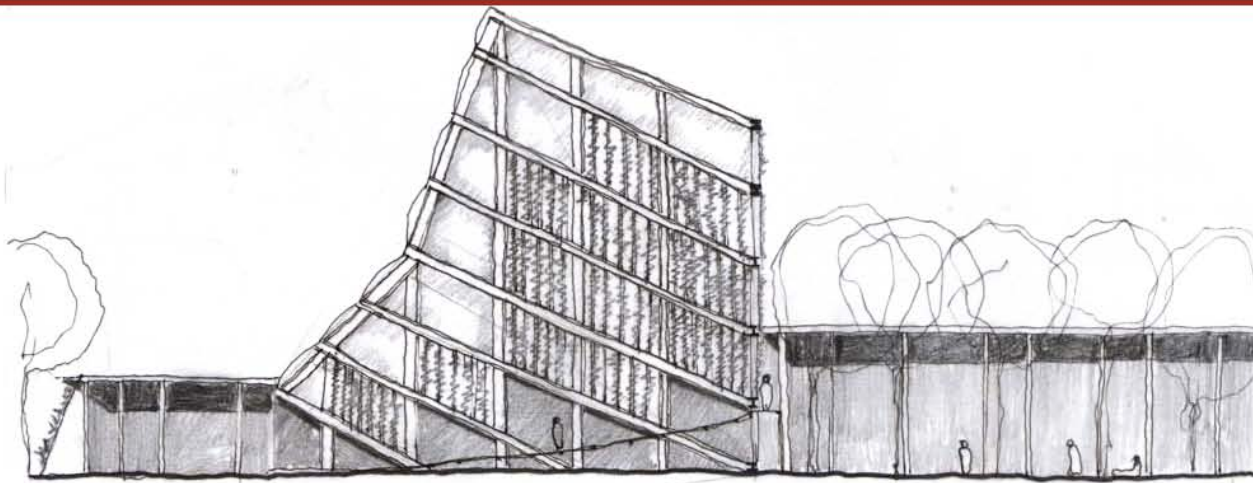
Elevation: Stacked greenhouse idea - June 2008
